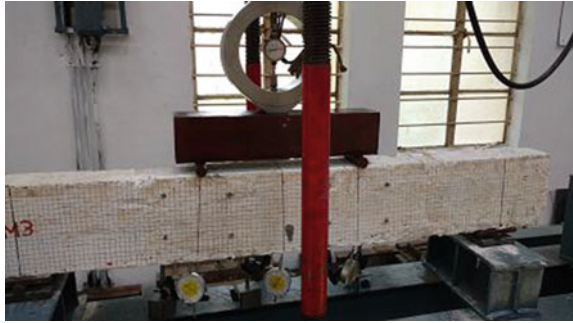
Typical crack pattern for a geopolymer beam without fibres
